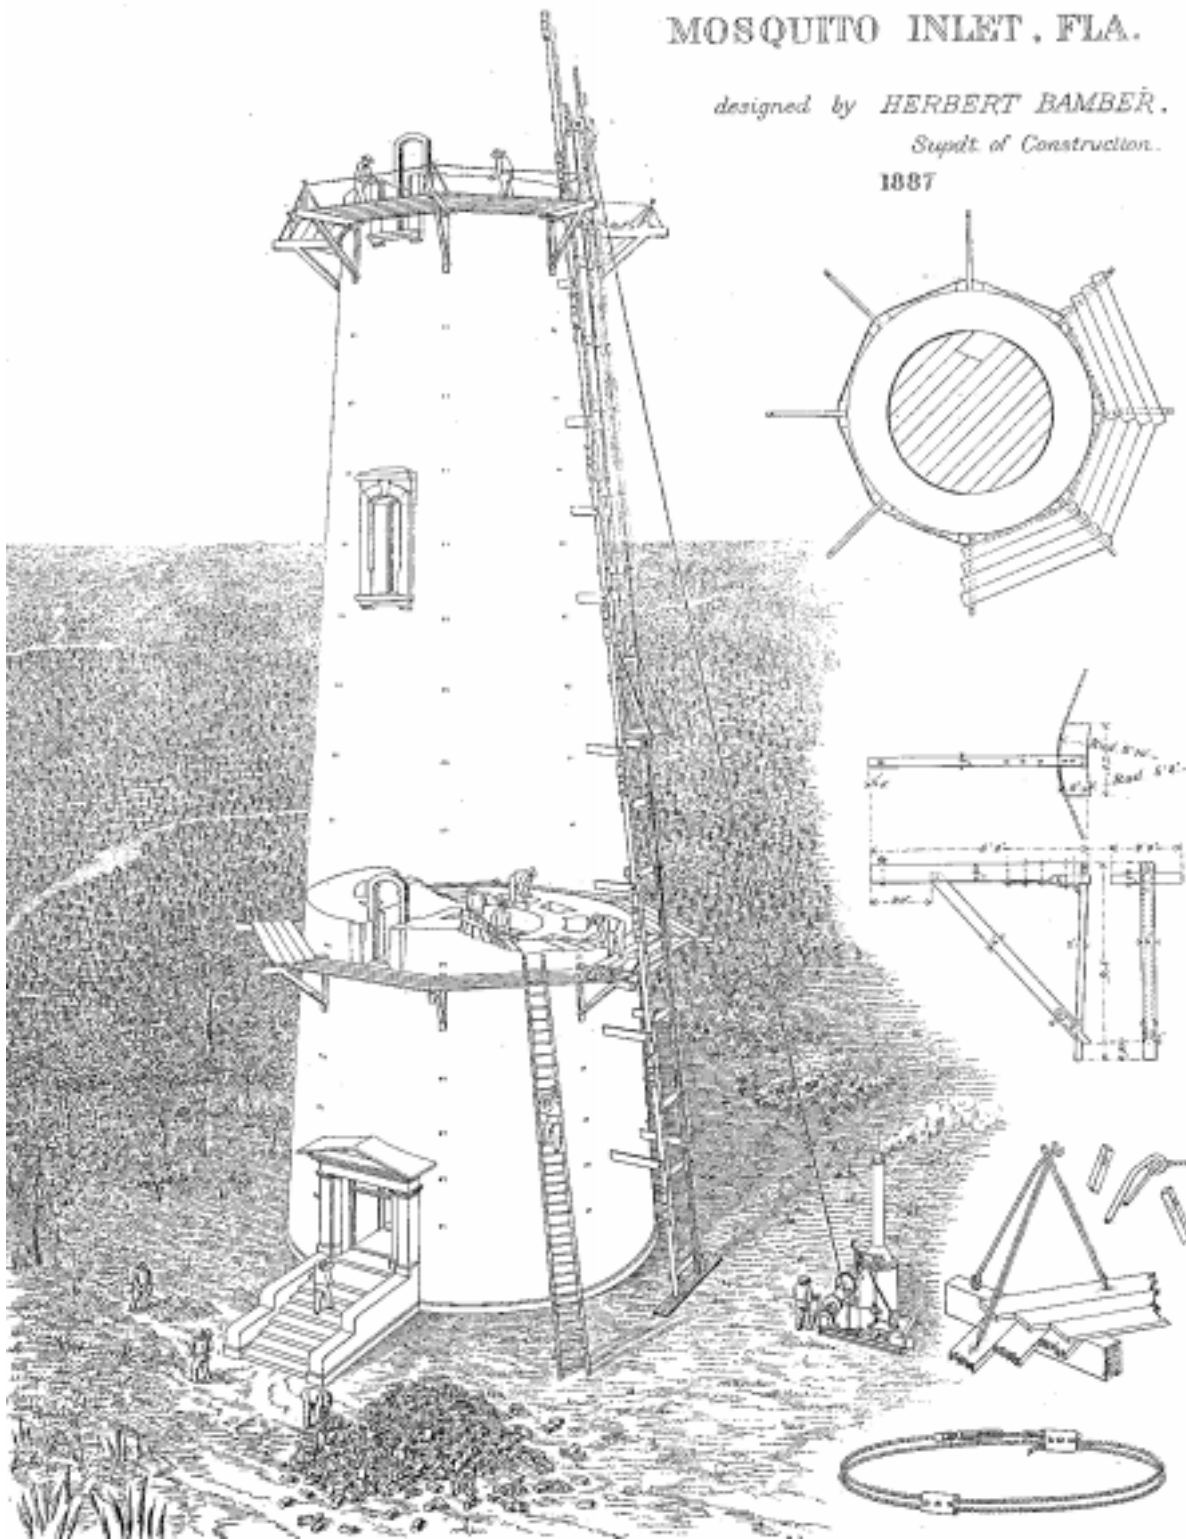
This construction drawing for Mosquito Inlet Lighthouse, Florida, shows the voids or cavities in the walls of tall masonry towers.
